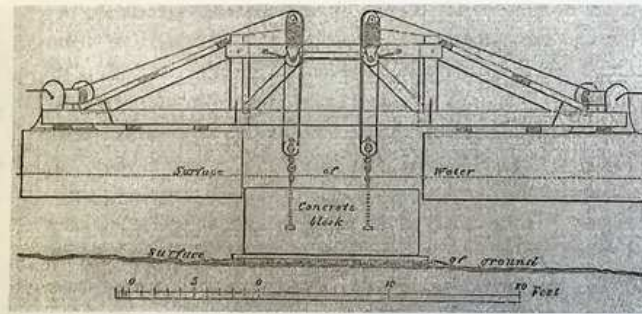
Lowering concrete block from pontoon [Stevenson]<sup>8</sup>
